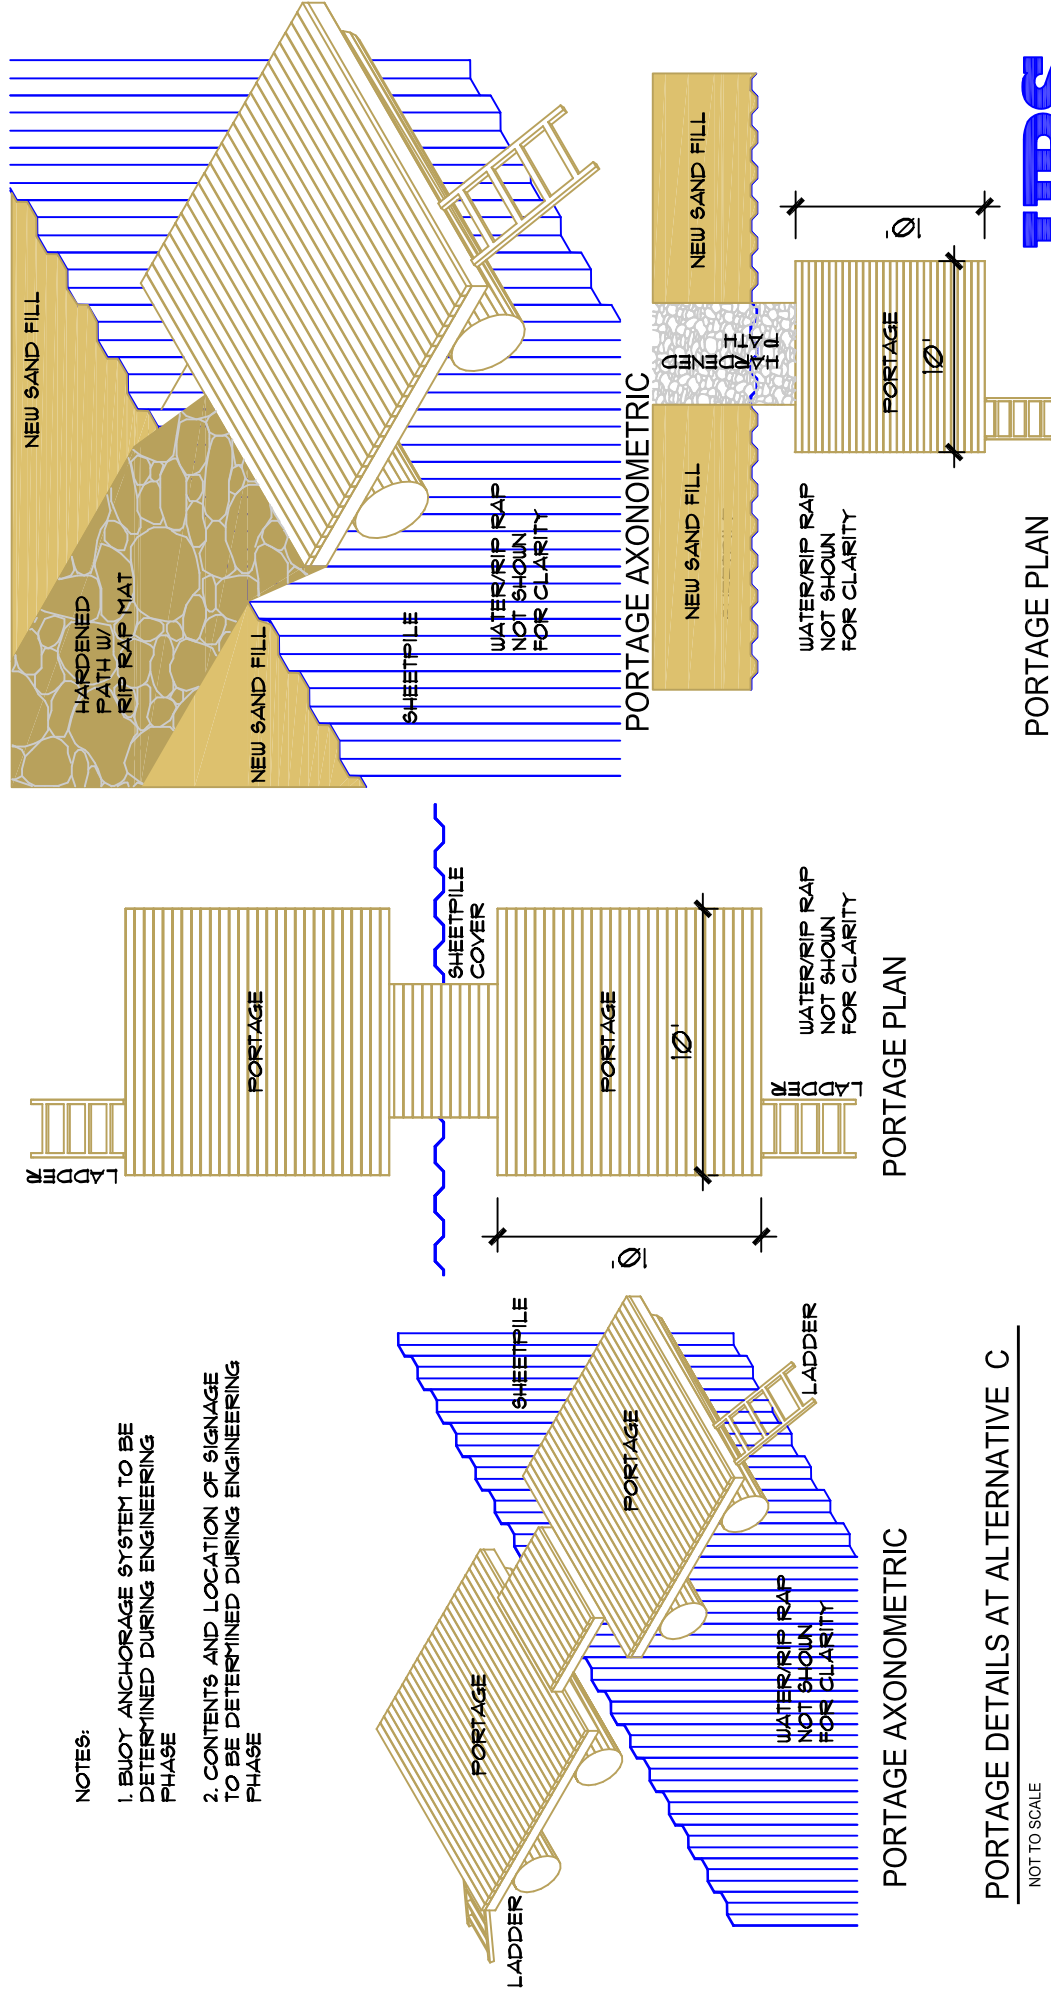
EAST CAPE EXTENSION CANAL DAM - PORTAGE DETAILS DRAWING
